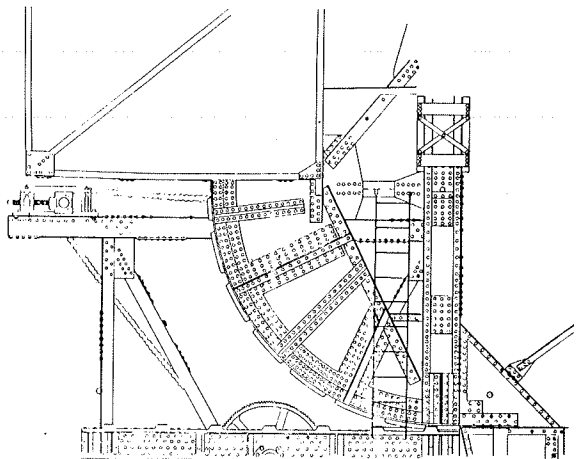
Photogrammetric documentation of rocker-arm detail, Hodges Ferry Bridge.
